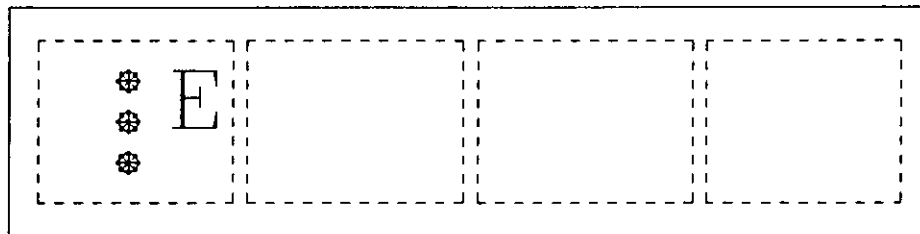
Beam A-1, Demec gauge placement on Panel E
